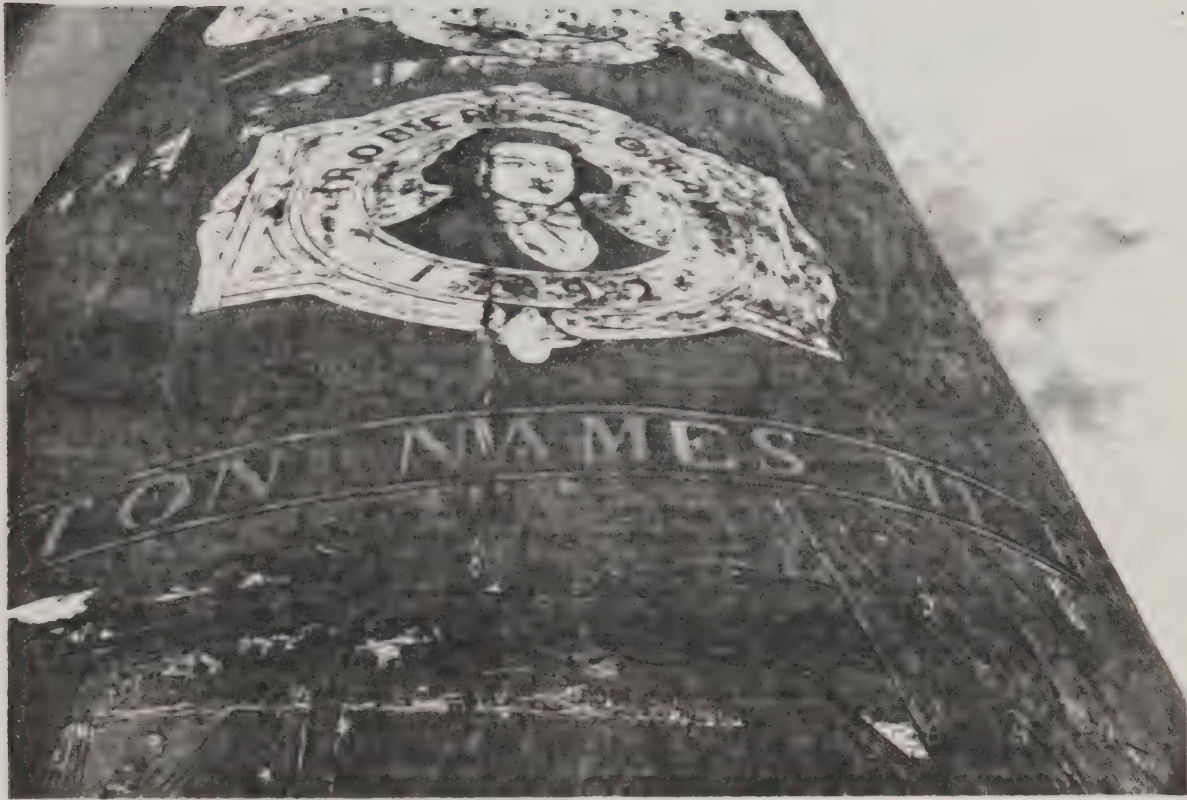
Photo Astoria Column Detail of Vertical Crack
